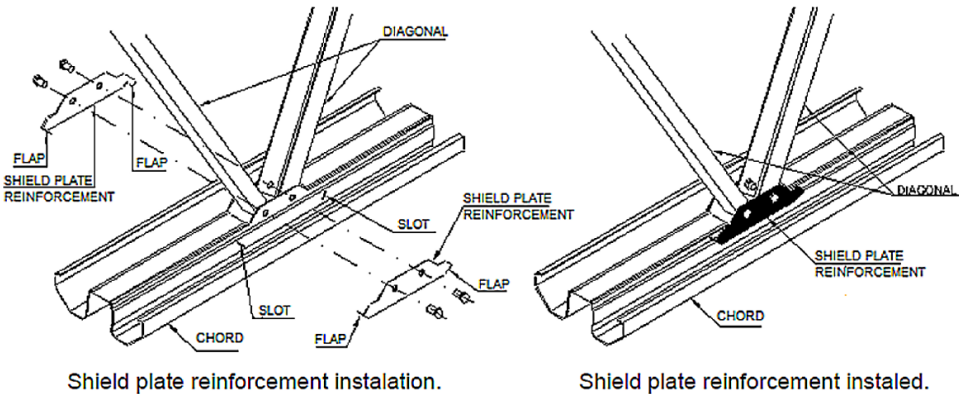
REINFORCED CHORD TO WEB DIAGONAL CONNECTION
